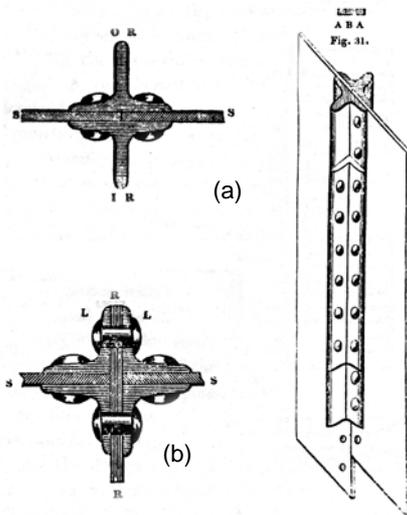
Final web stiffener design. (a) typical detail, section and axonometric view. (b) detail of first and last 30 stiffeners on either end of each tube segment. 1847. (Dempsey)
